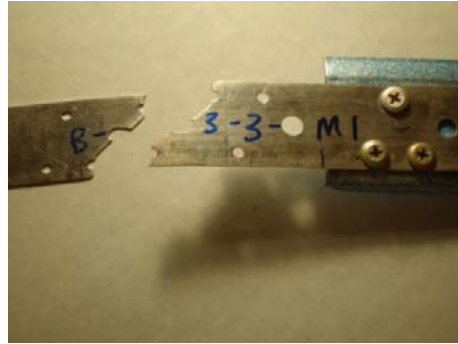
Net Section Failure away from the Connection: Specimen B-3-3-M1
